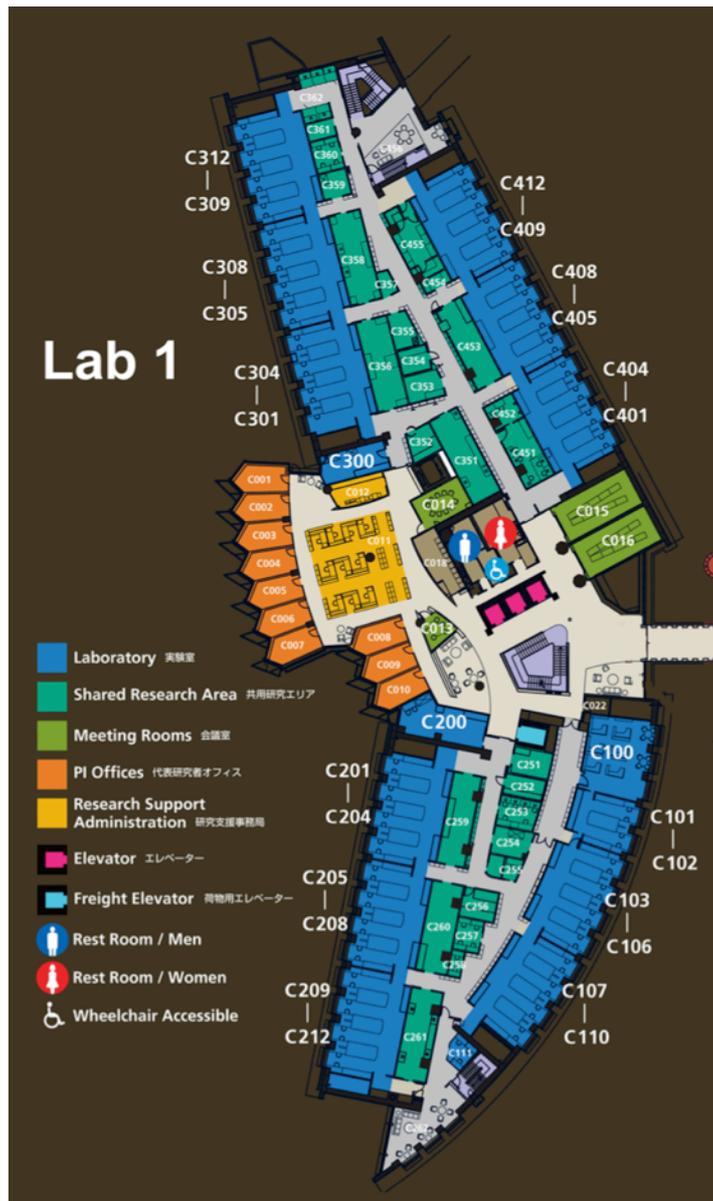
Lab building typical floor plan, illustrating the locations of laboratories, shared resources, meeting rooms, and faculty member offices.
